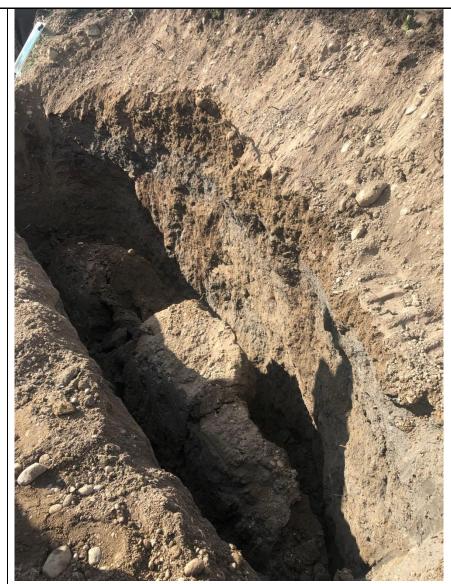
View towards excavation bottom of TP-1. Small berm to the right. Test pit TP-1 caved at the contact of the bottom of berm.
